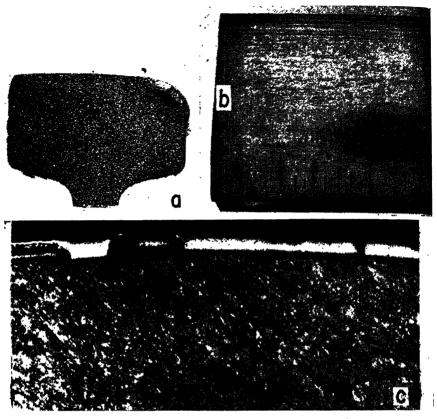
Detail Fracture from Head Checks on Low Rail on Curve.
